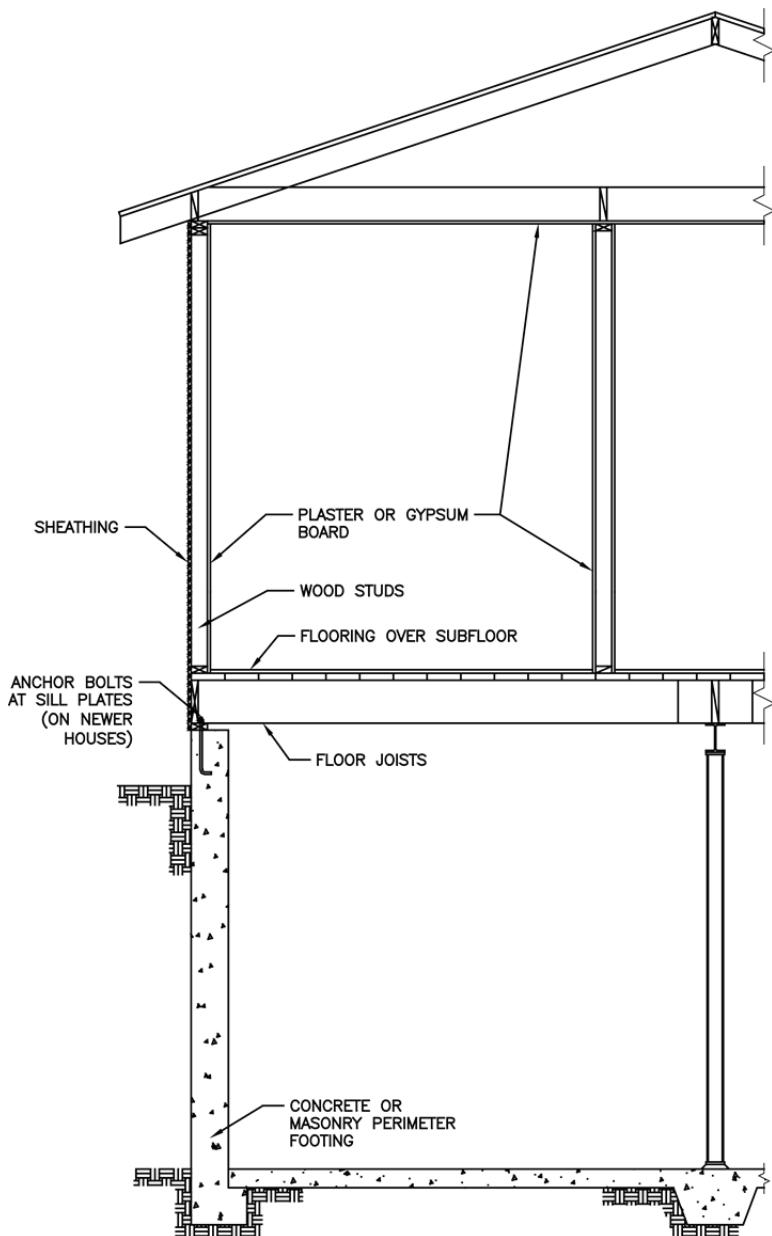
Section through a typical one-story basement house (from ATC, 2002b).
